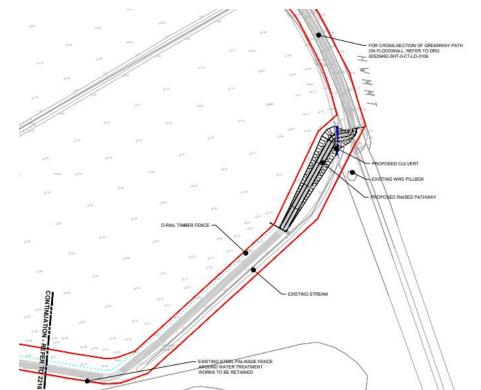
Proposed plan showing the greenway joining the existing coastal path. Drawing 81.
